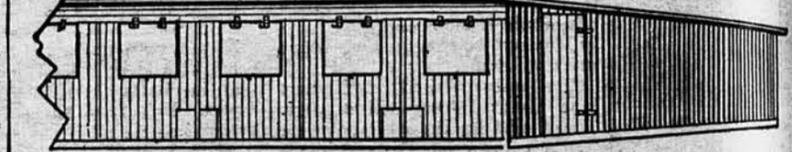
A section of completed laying house which is 60 feet long and 14 feet wide.
